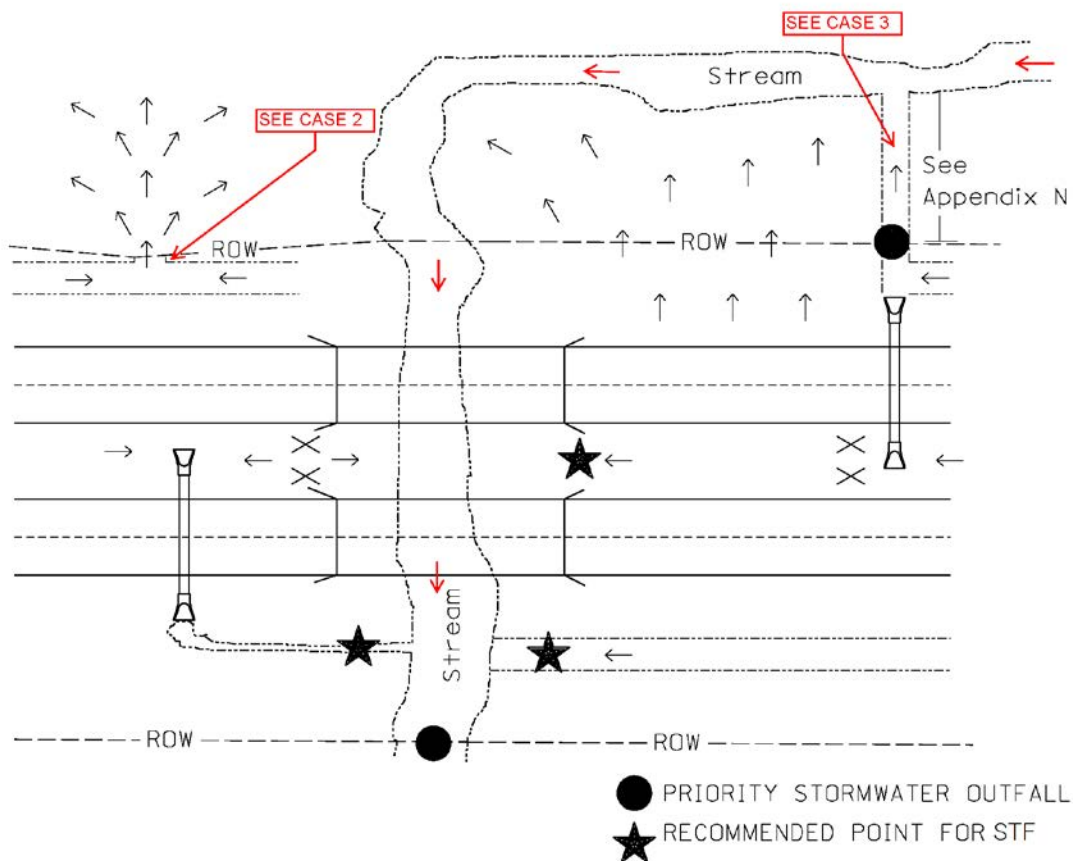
Examples of Priority Stormwater Outfall Locations
